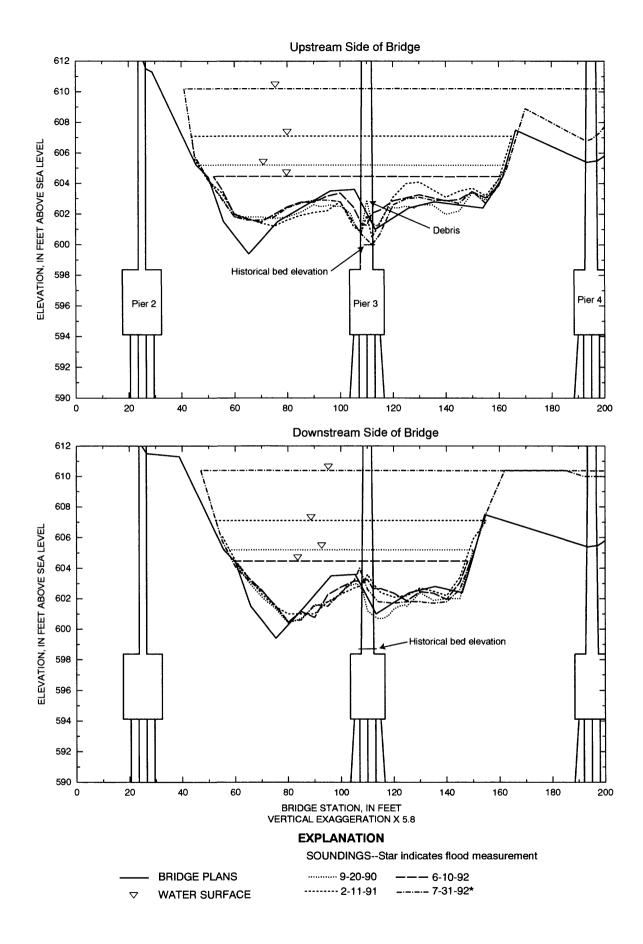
Cross sections showing bed elevations from bridge plans and soundings, State Road 11 over Flatrock River at Columbus, Indiana.
